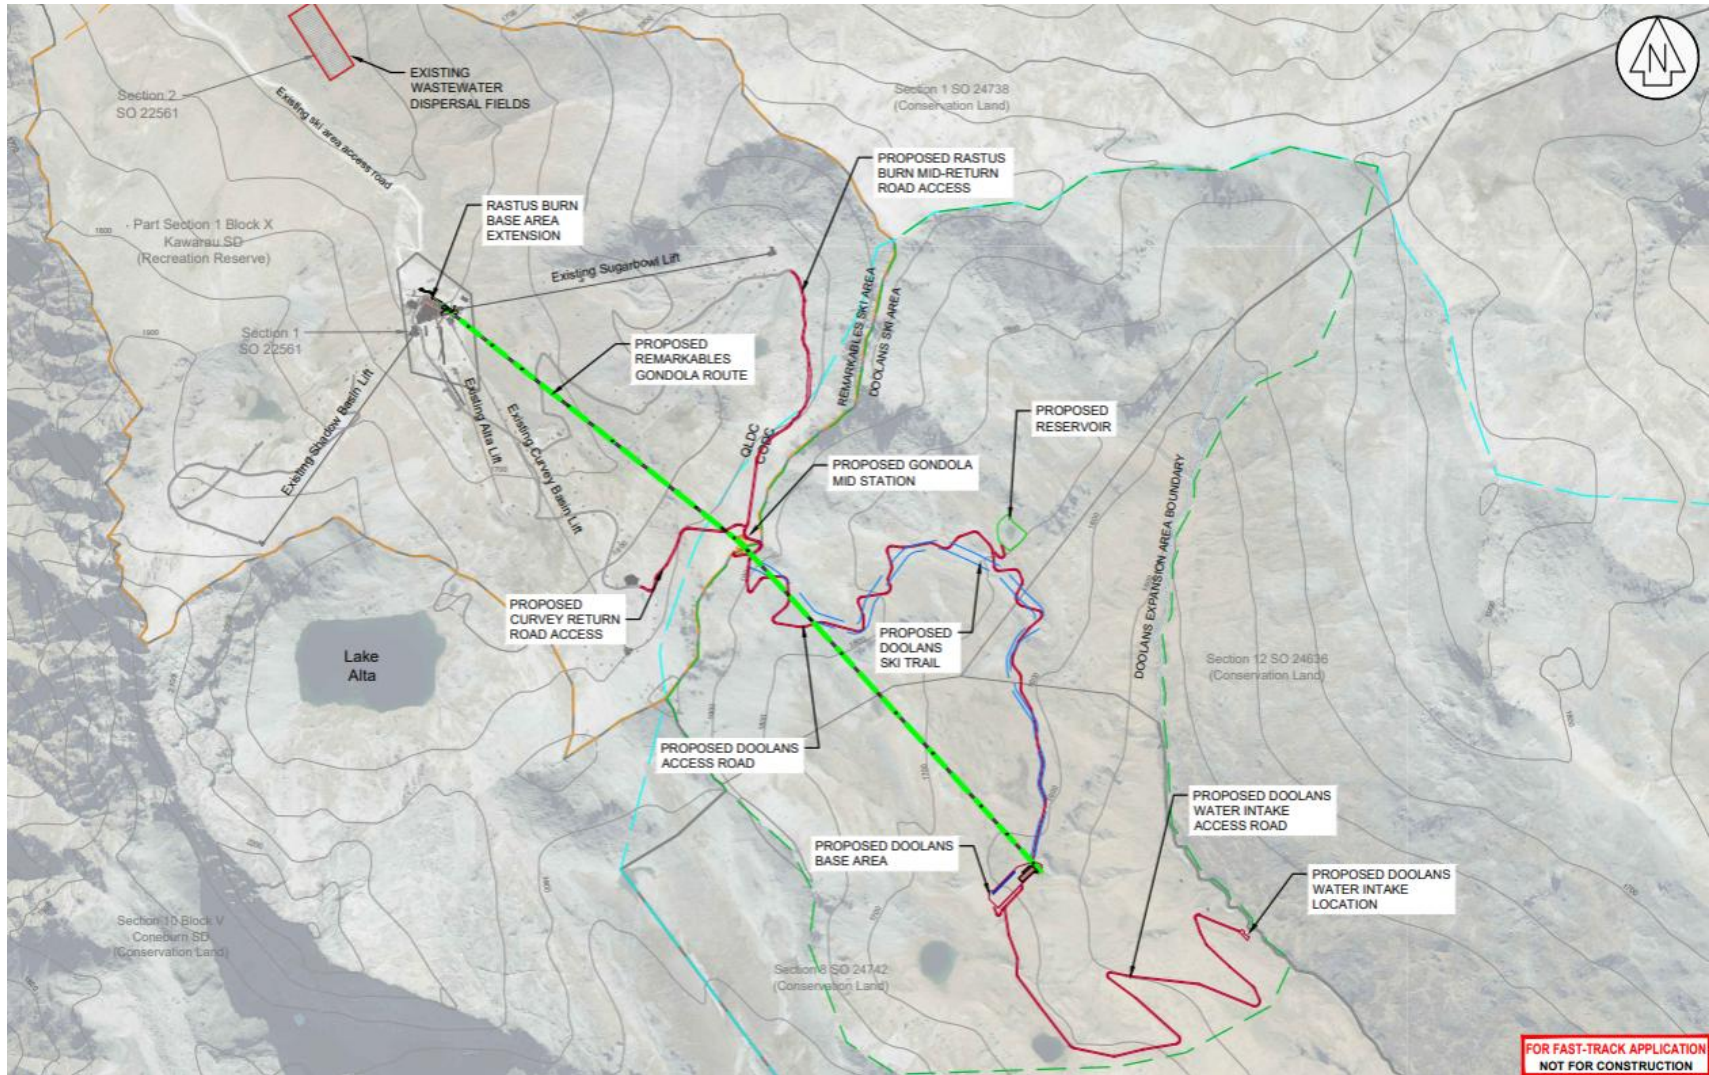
General Arrangement of the Remarkables Upgrade and Doolans Expansion Project
